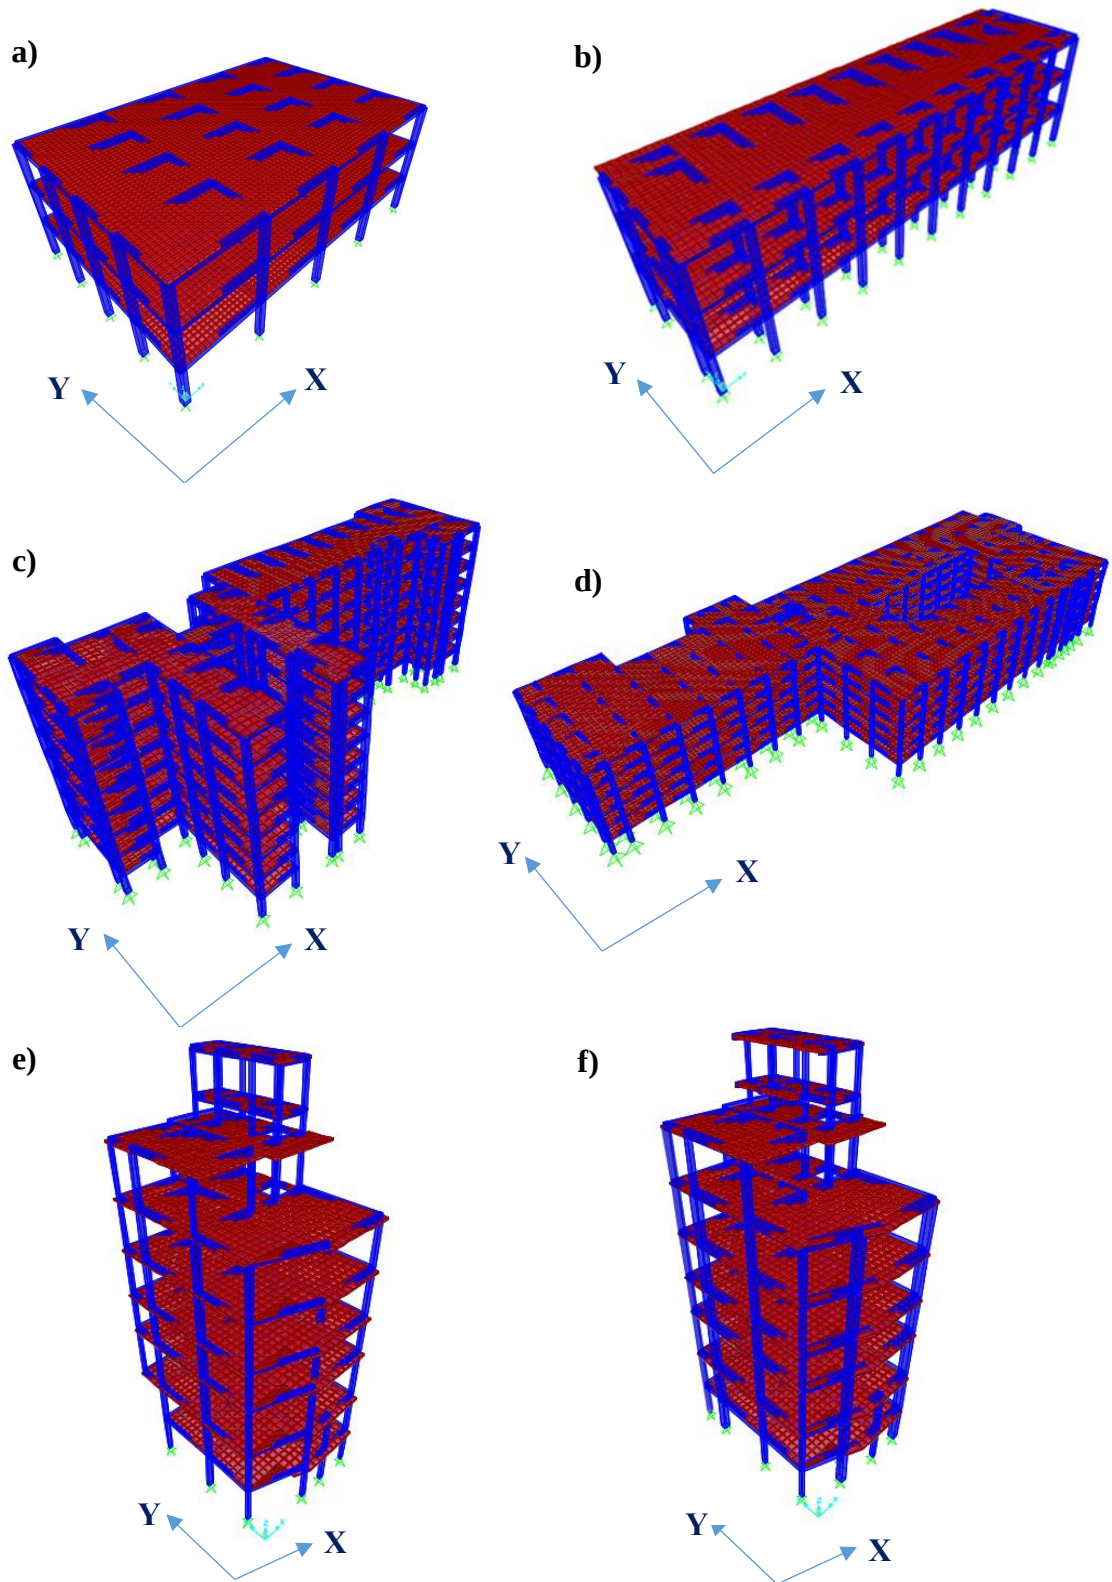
Principal directions of the buildings a) typical building, b) school building, c) university building, d) hospital building, e) defective building, f) retrofitted building
